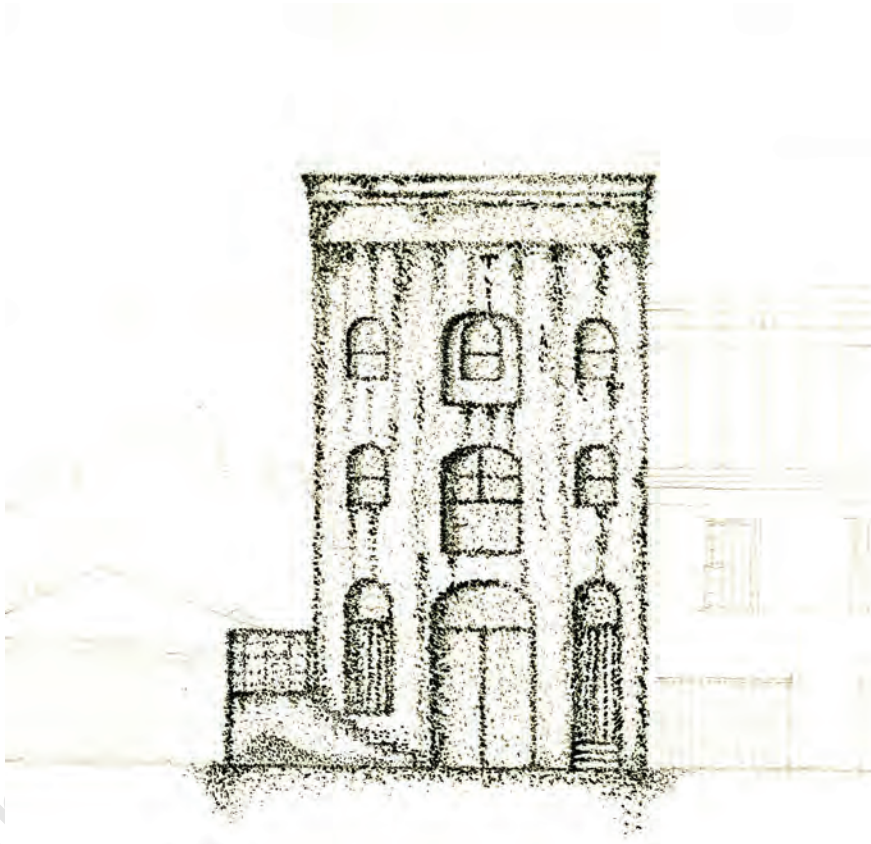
Gawie Fagan Architects offices, Bree Street, Cape Town. 120 year old Cape warehouse type building, one of two remaining, Representation of weathered building as it stands today - by author
